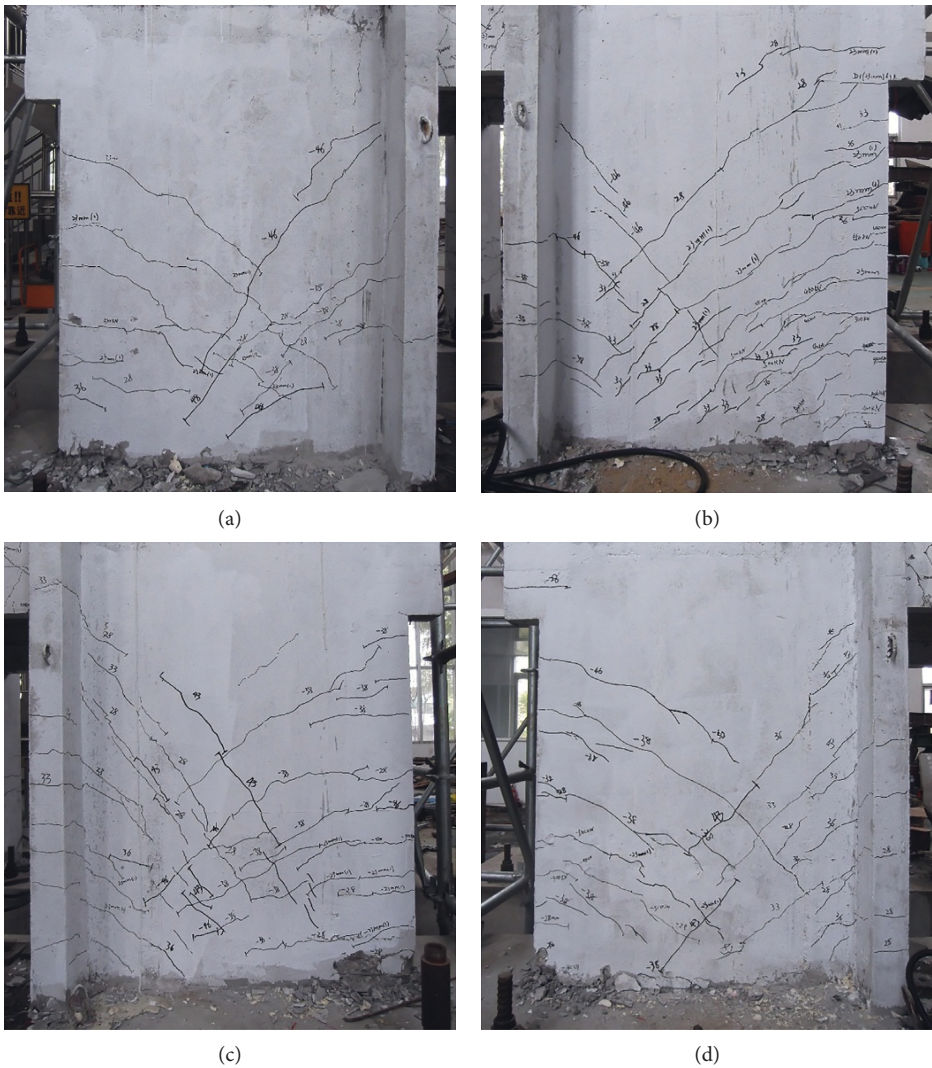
Cracks distribution on precast shear walls. (a) Precast shear wall A. (b) Precast shear wall B. (c) Precast shear wall C. (d) Precast shear wall D.
